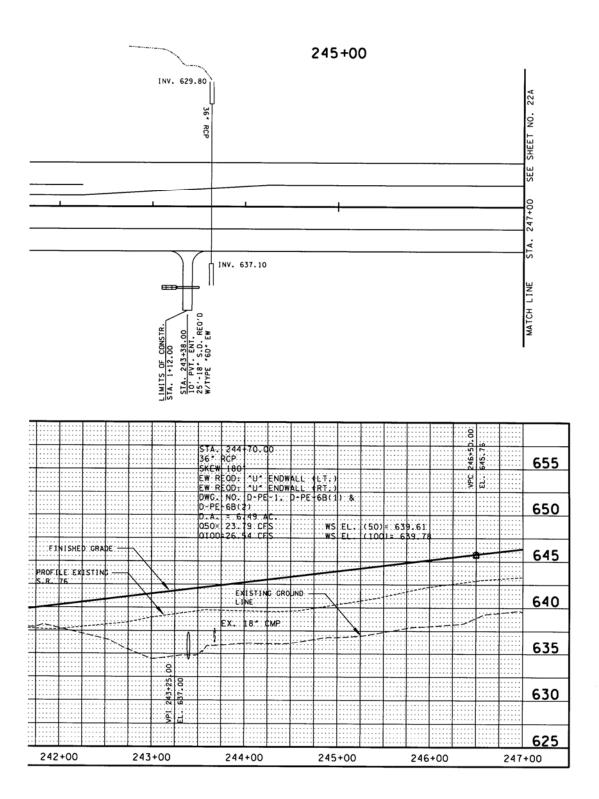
A-6. Portion of Proposed Layout Sheet (Pipe Culvert)
